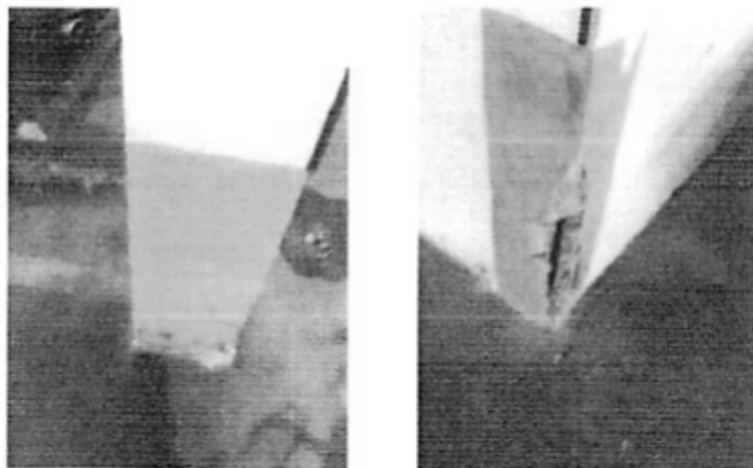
Typical cracking and spalling at parking garage columns
